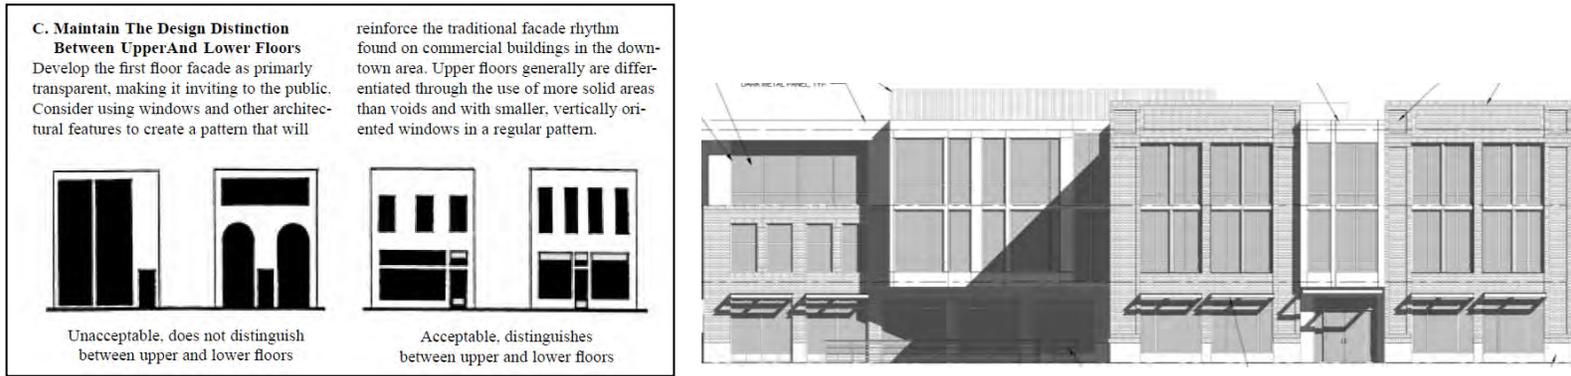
Guideline 2.6.C. and West Elevation of Proposed Project
